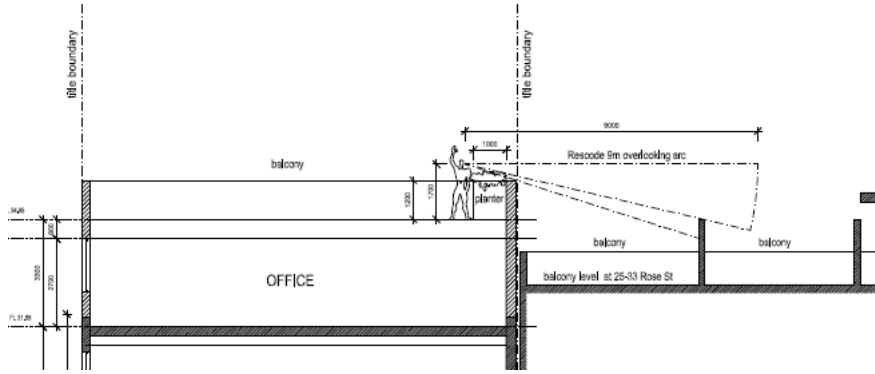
Section identifying intent of planter box at the south-west corner of the third floor as a means of addressing overlooking into the balconies of the western adjoining dwellings.
